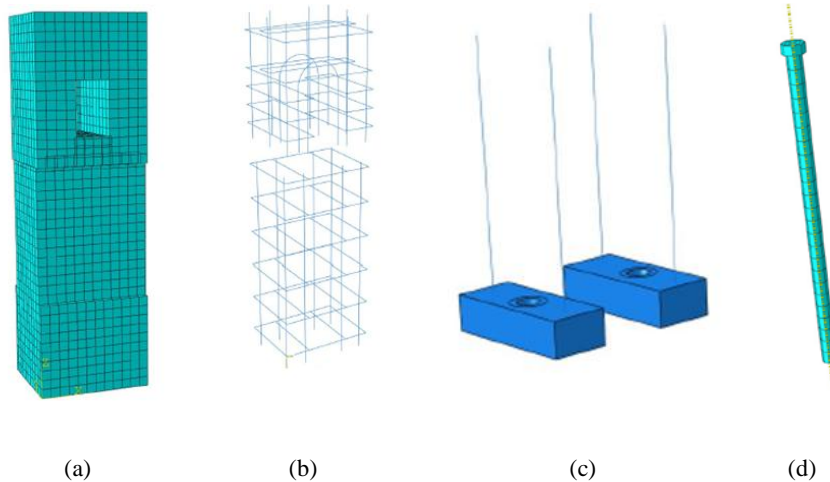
Elements modelled: (a) concrete, (b) reinforcement cage, (c) coupler plates, (d) baranchor.
